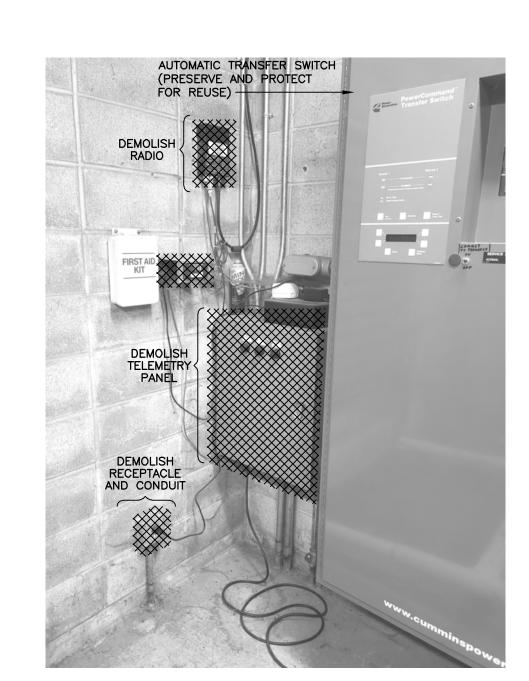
/E-9 NORTHEAST CORNER SCALE: NONE
